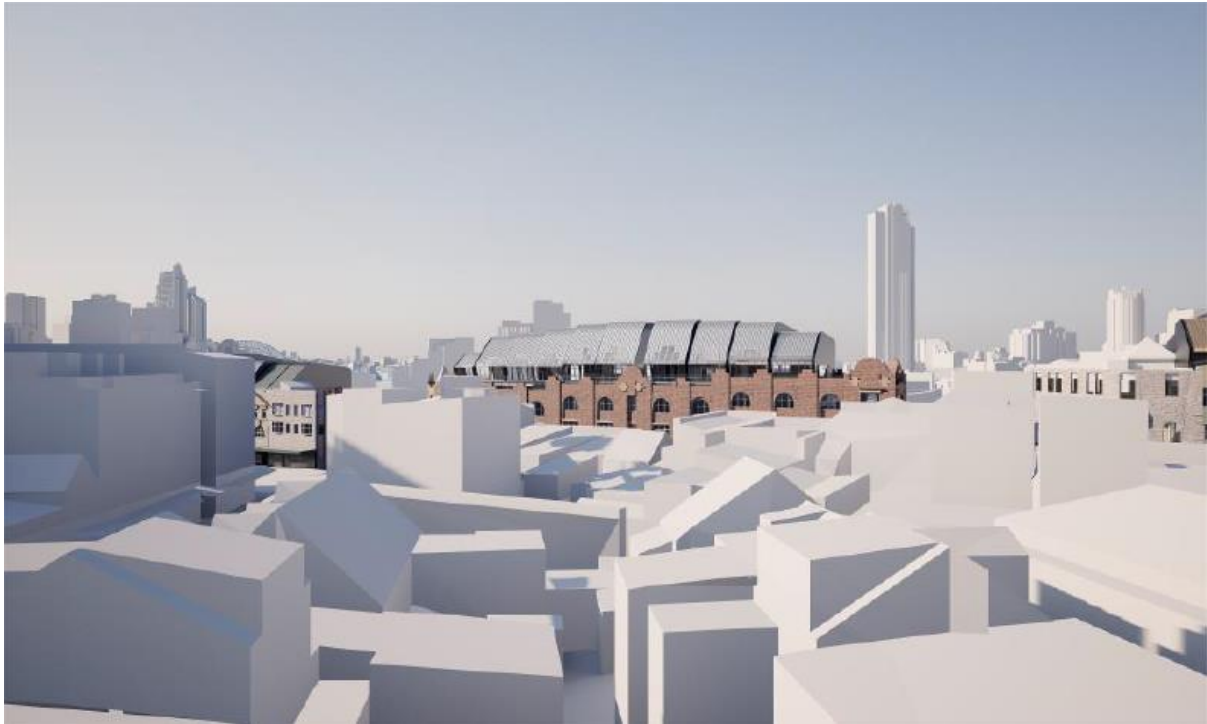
Modelling from applicant's view loss study, as viewed from Level 6 of 302 Crown Street
